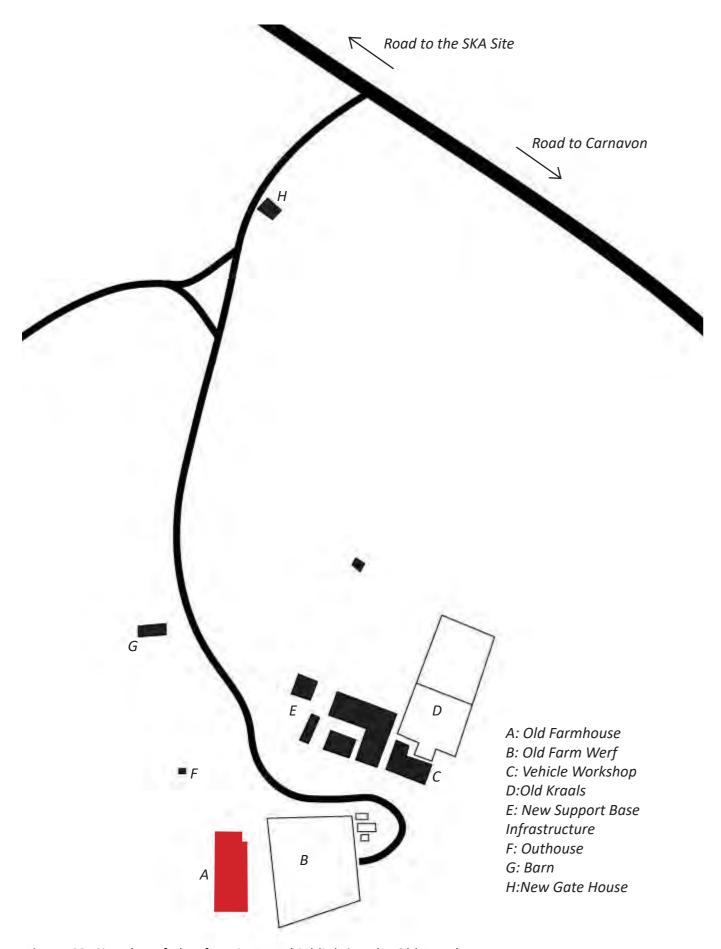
Site Plan of Klerefontein Farm highlighting the Old Farmhouse
